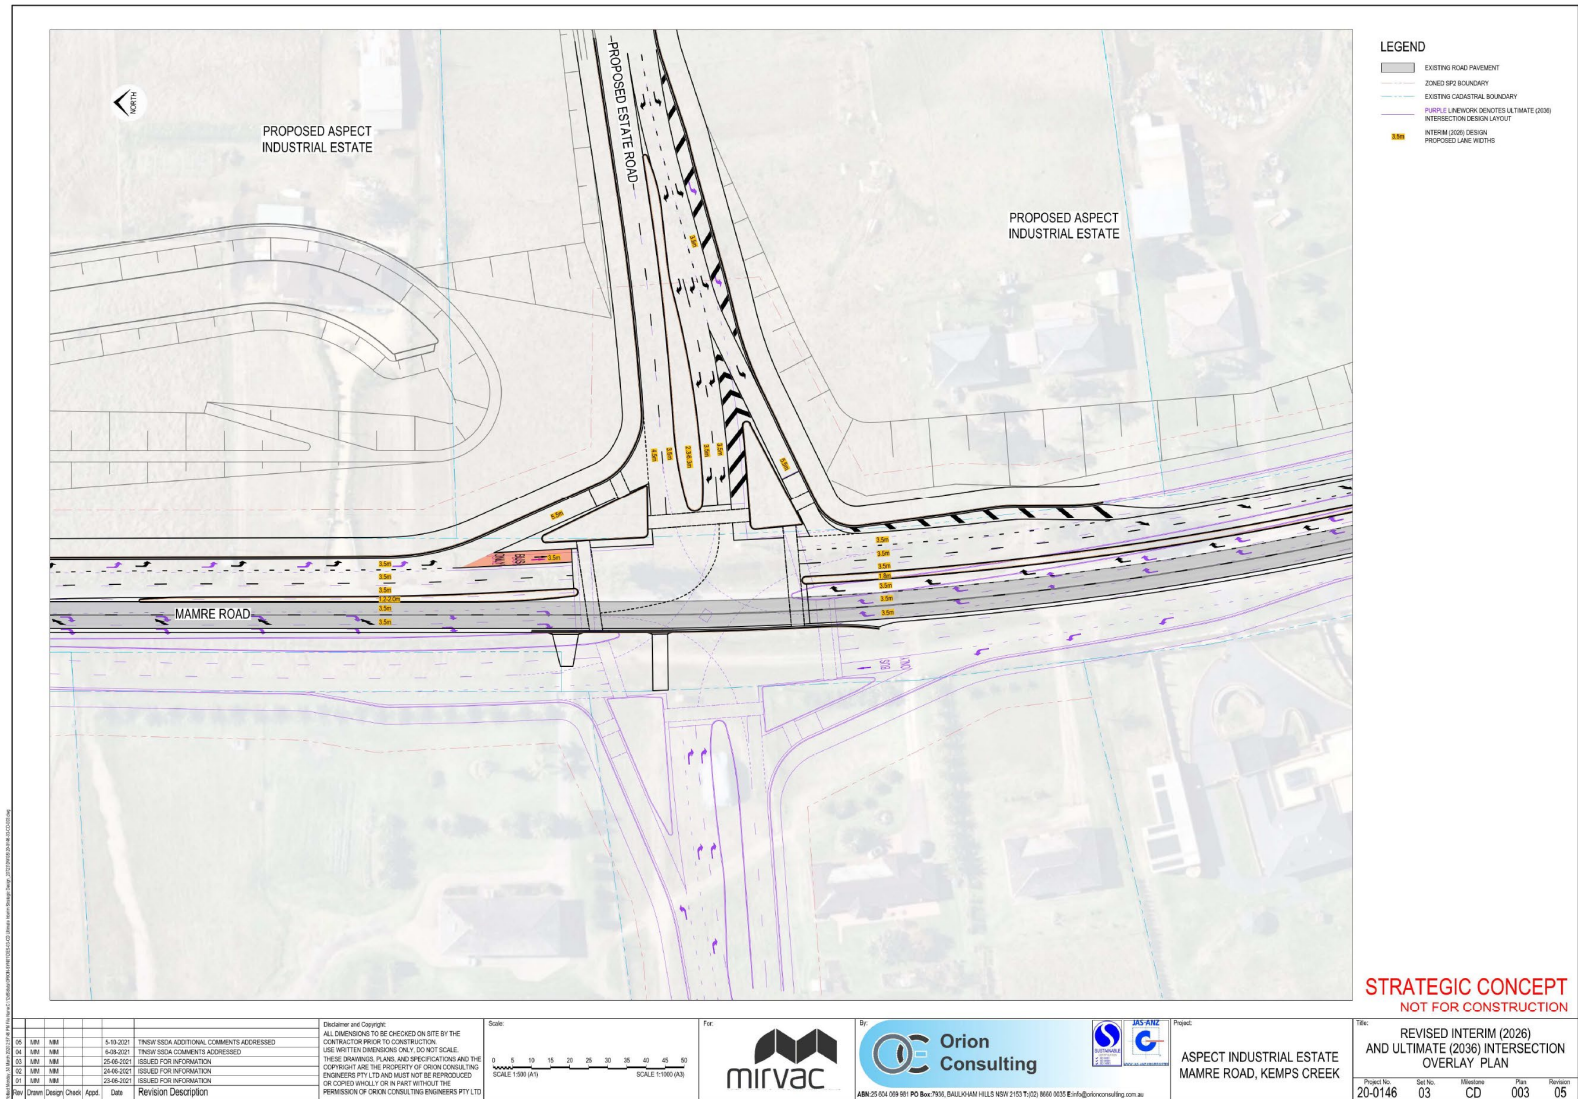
| Proposed Mamre Road / Access Road 1 intersection
